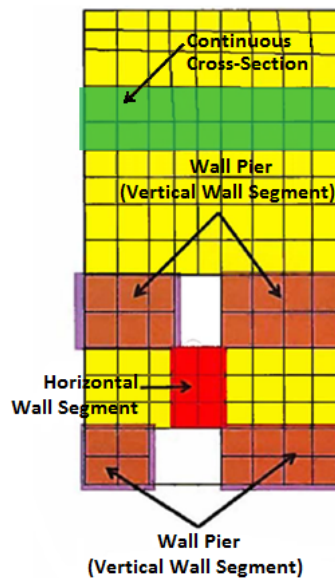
Vertical and horizontal segments in a typical NPP reinforced concrete wall.
